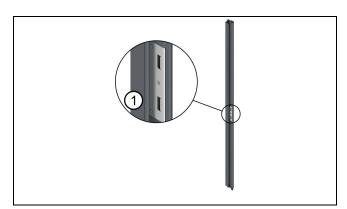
Outswing Locking Jambs: Strikes are installed from the factory. Support for the strike is fastened through the back of the jamb.
